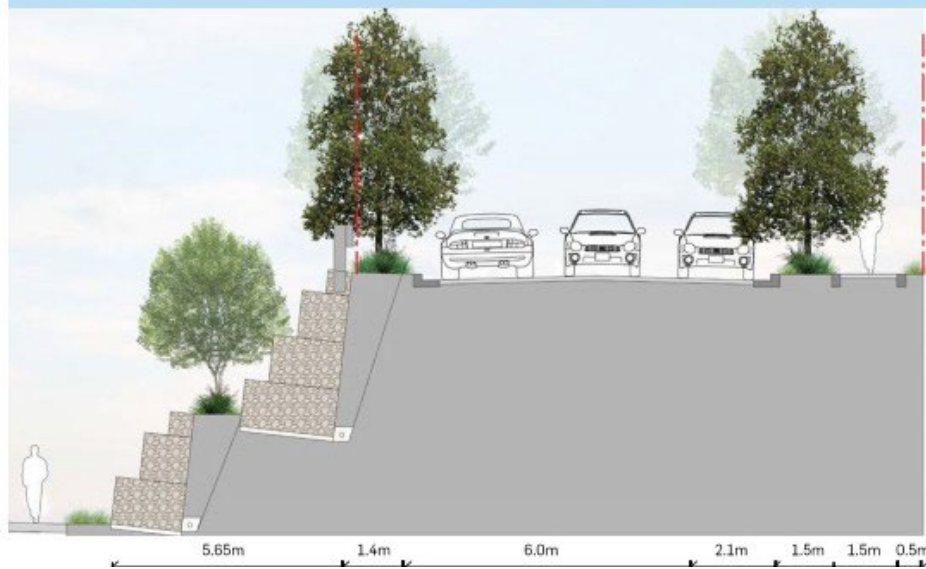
D - Local Street Perimeter - 13m Road Reserve
